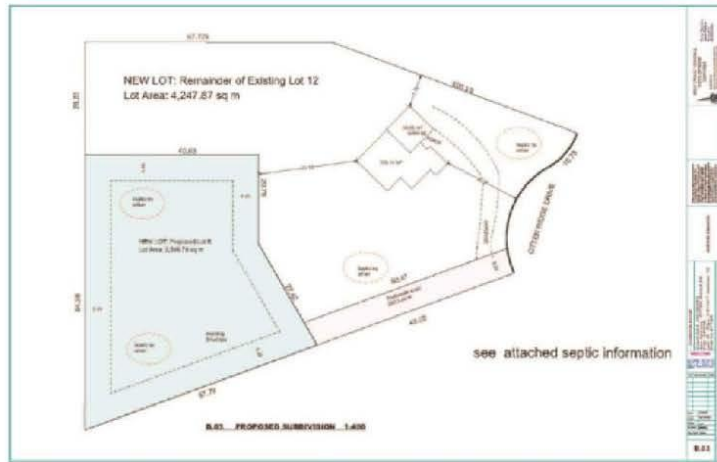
Site Plan showing the location of the proposed subdivision Lots, location of the building area, septic disposal fields (approved by Island Health), and the panhandle access driveway.
